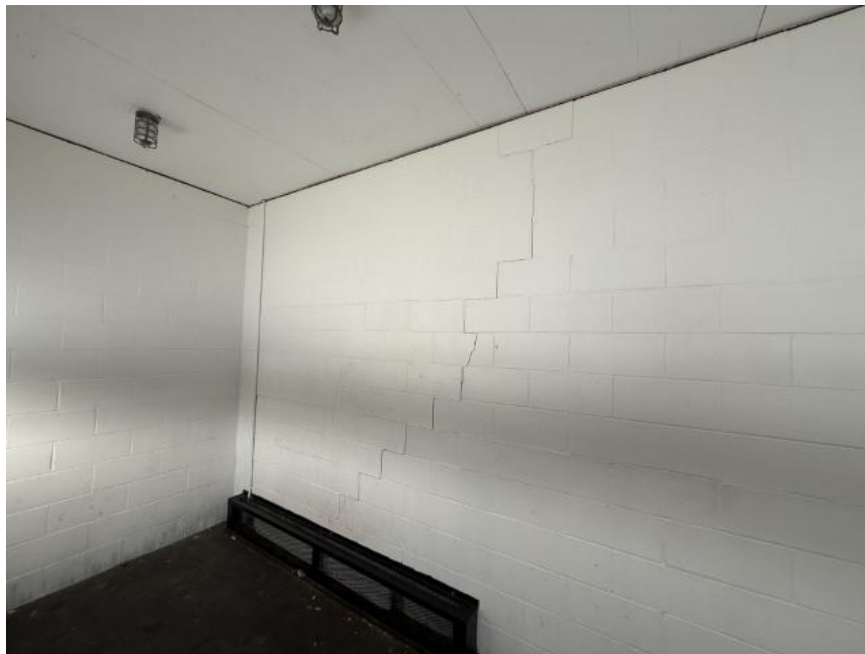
Changing/Storage Building – Typical Step Cracking and Cracked CMU
